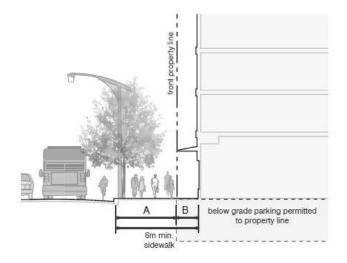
Diagram of 6 metre sidewalk suggested for Avenues with right-of-ways greater than 30 metres
